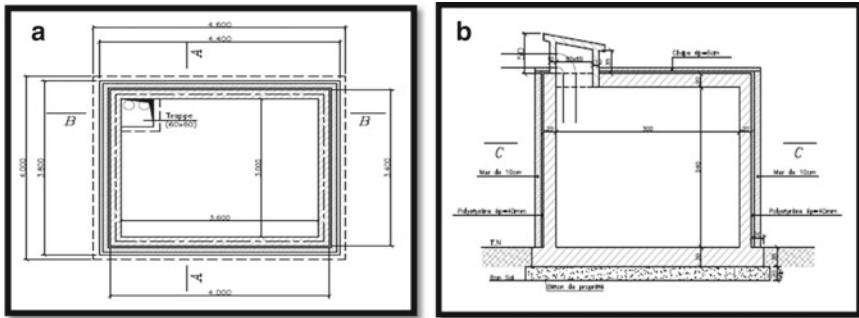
a Cut formwork plan C–C, b cut formwork plan A–A
